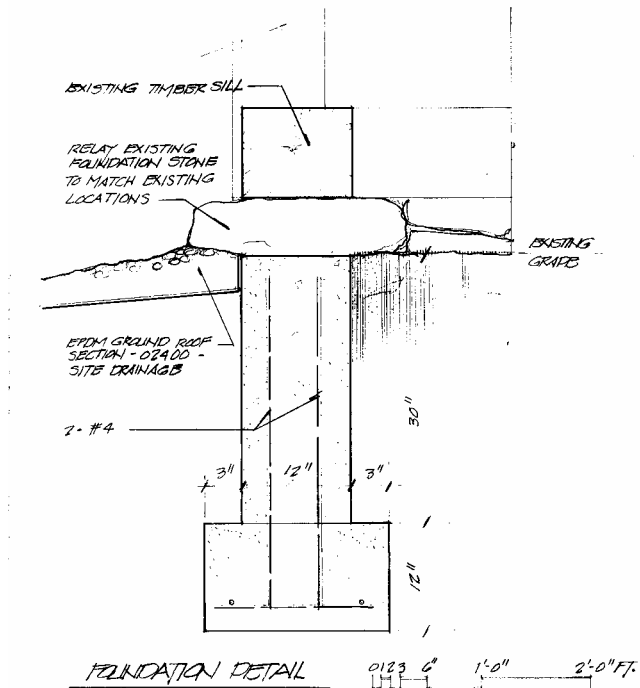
The original footing detail was modified based on field conditions to surround and buttress the existing stable stone base.
